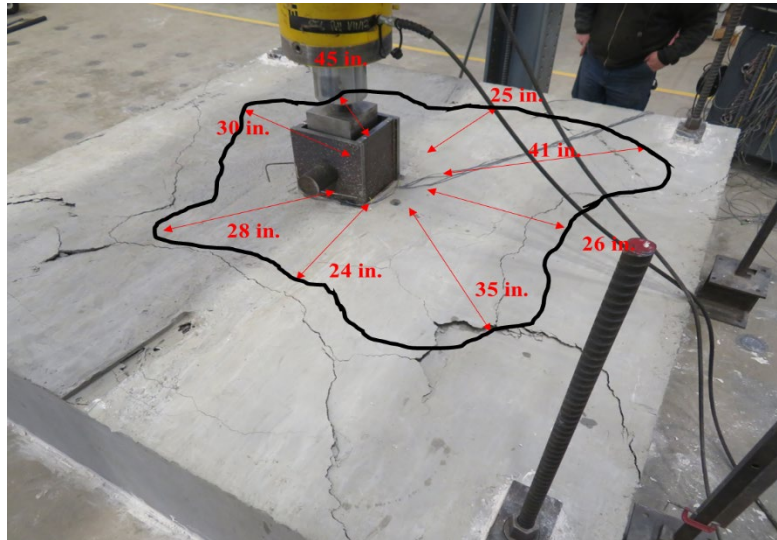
Plan view of cracks and formed on the concrete surface
